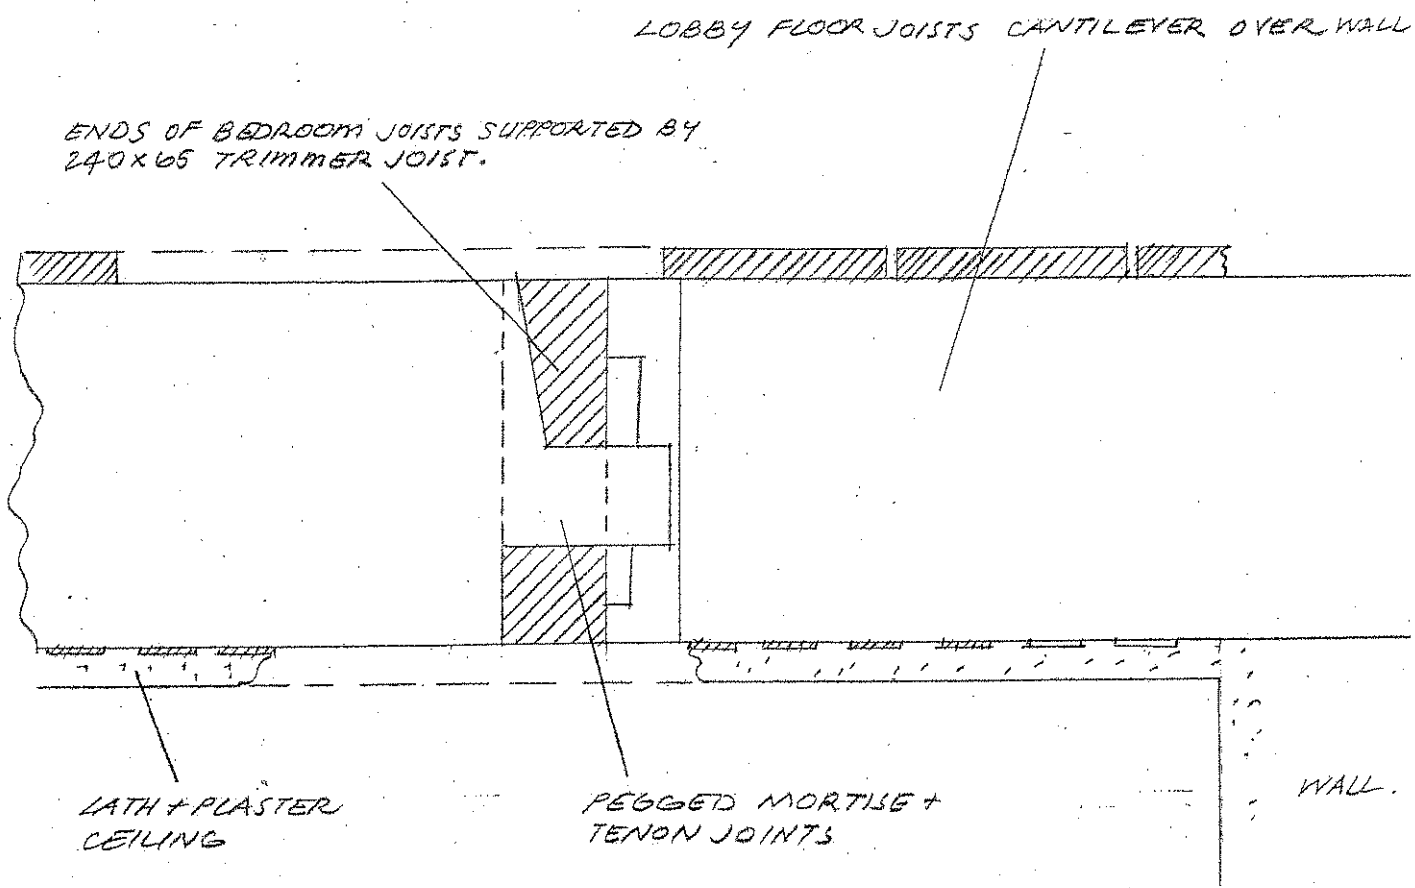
WEST WALL SEATING OF CENTRAL BEAMS Scale 1:10
